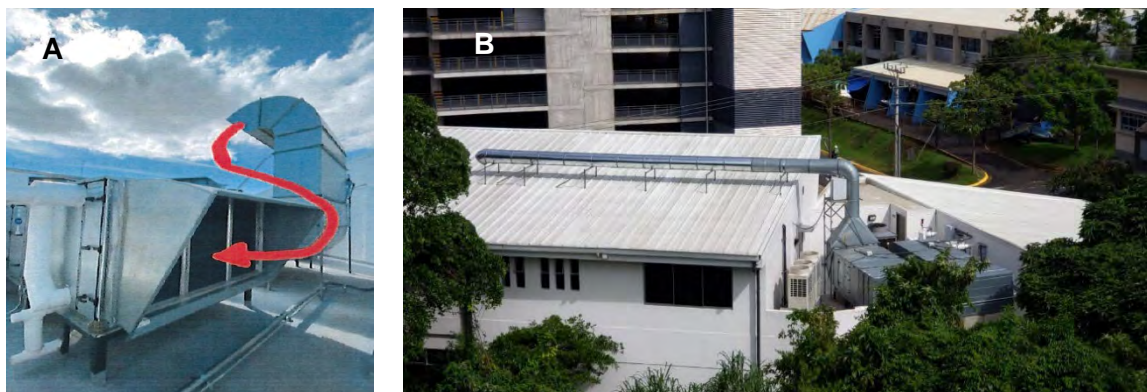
A. Inlet and outlet pipe HVAC system initial arrangement installed in the building and radioactive gas trajectory entering production main floor. B. Final placement of the outlet pipe.
